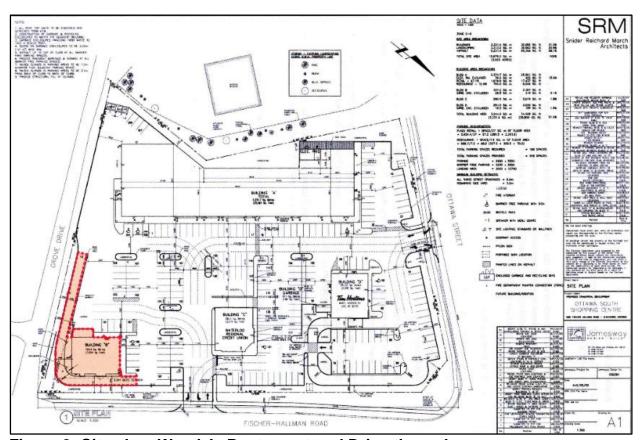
Site plan- Wendy's Restaurant and Drive-through
